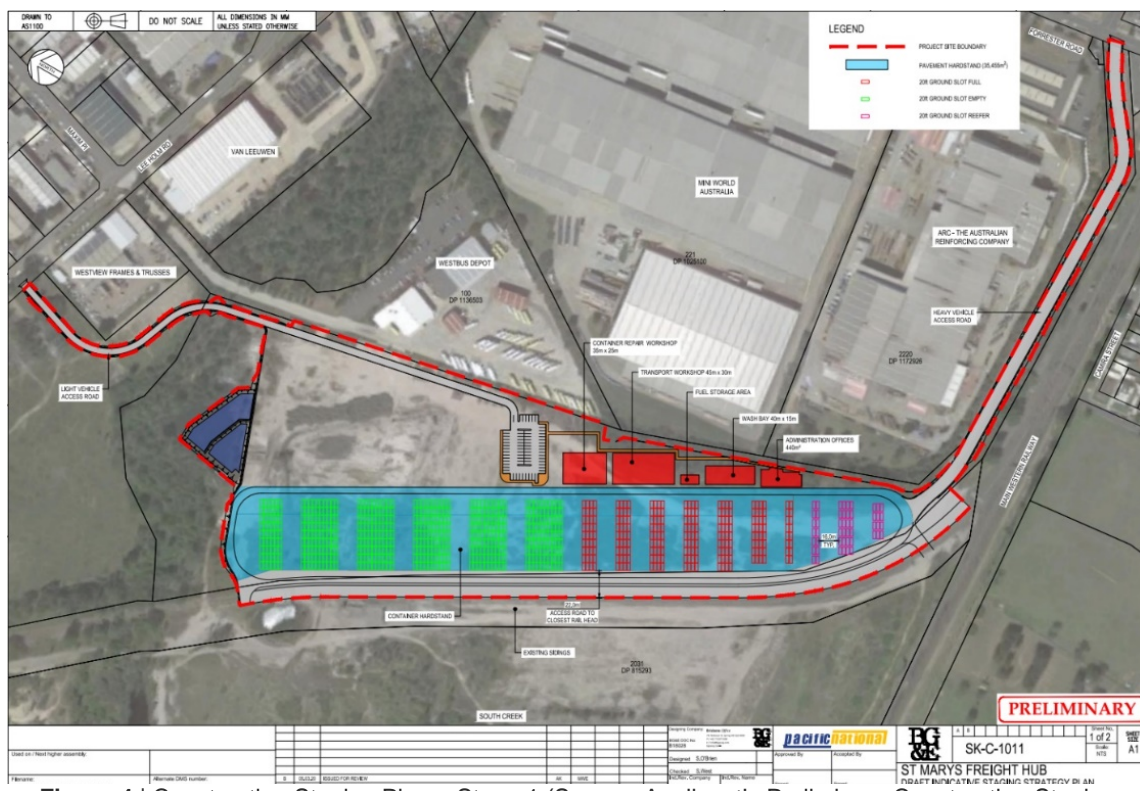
| Construction Staging Plan – Stage 1 (Source: Applicant's Preliminary Construction Staging Strategy)
